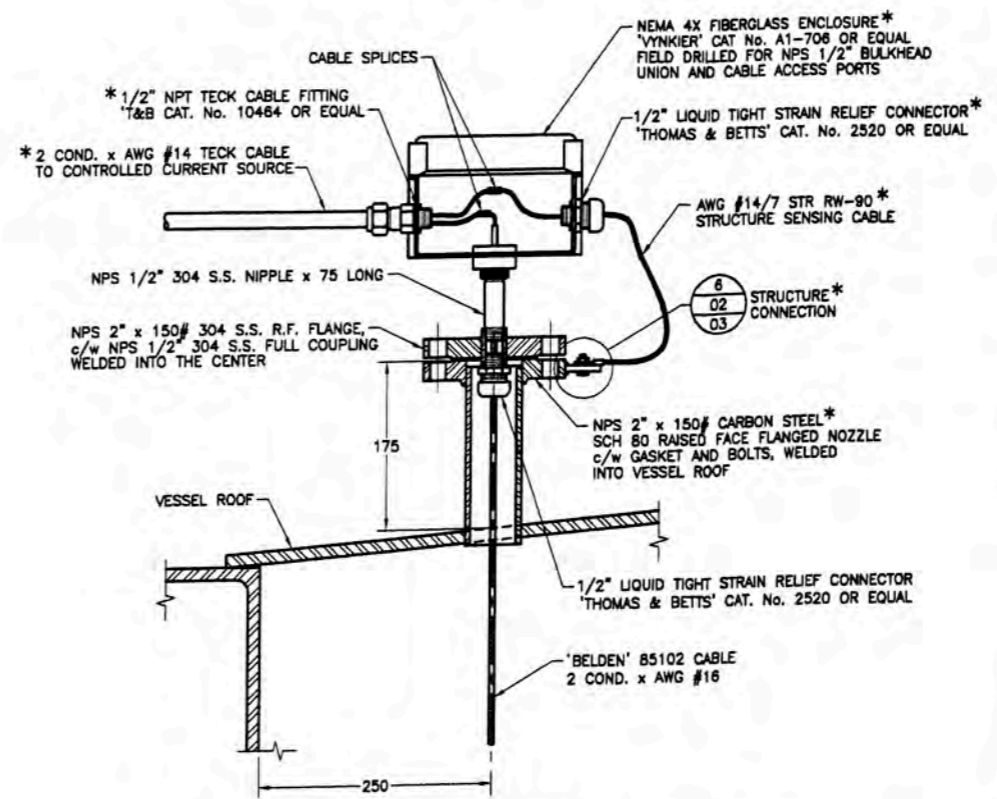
/01/02 TYPICAL CATHODE ASSEMBLY
